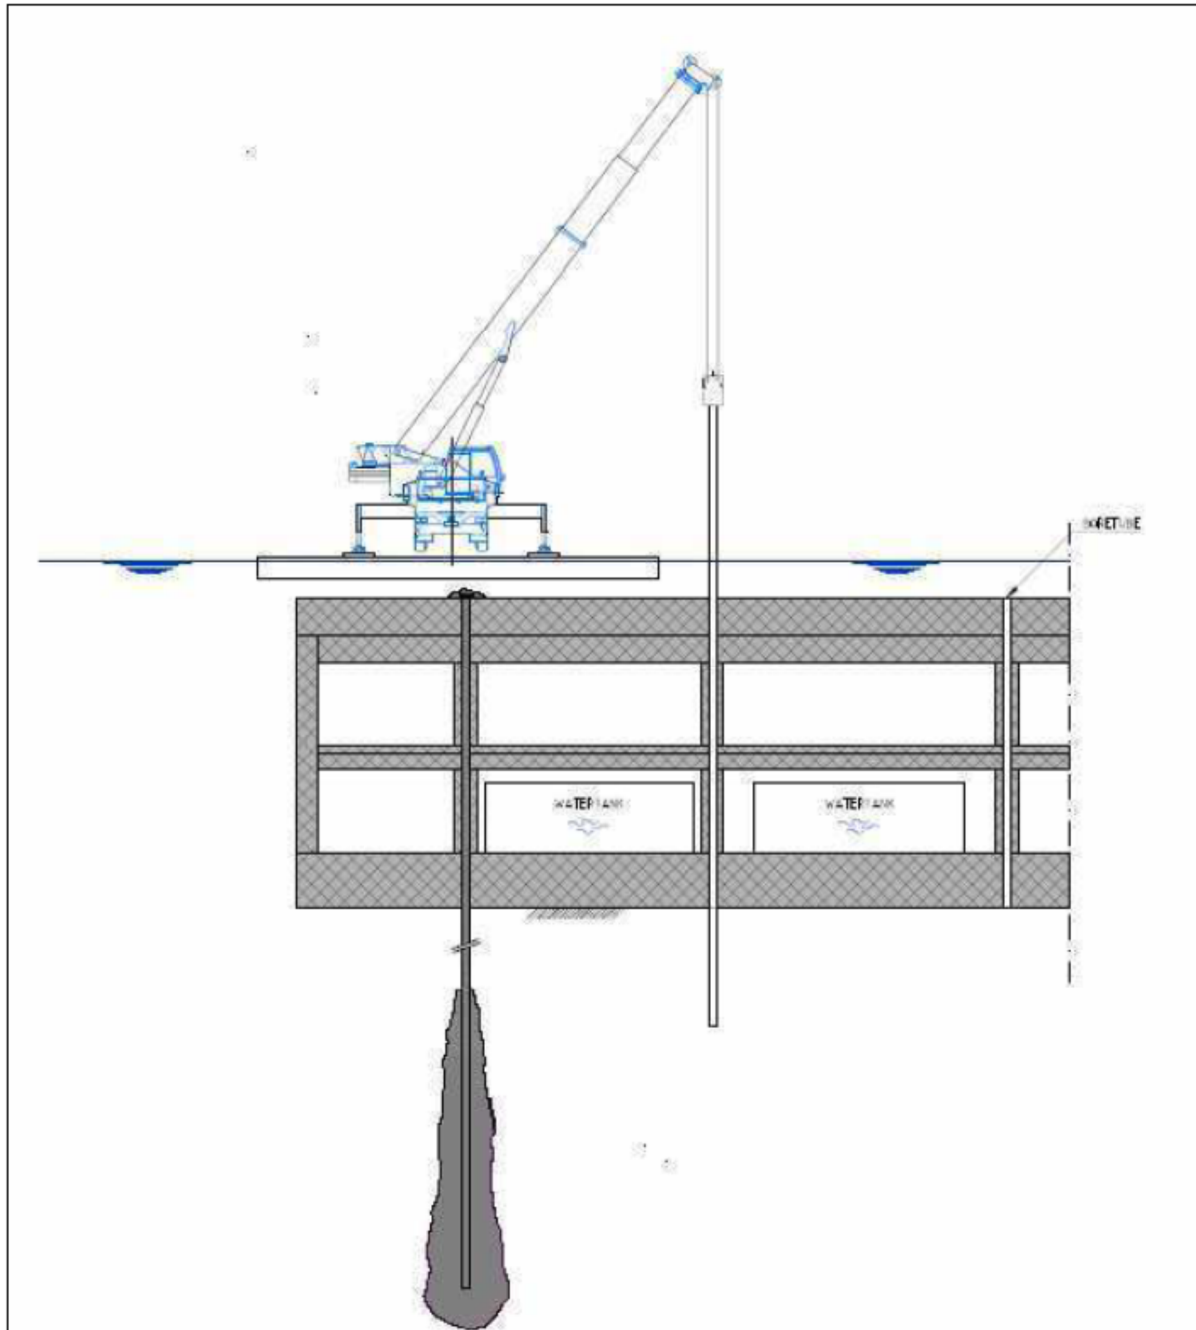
Installation of grout anchors through columns. [Maarten Faber, 2008]
